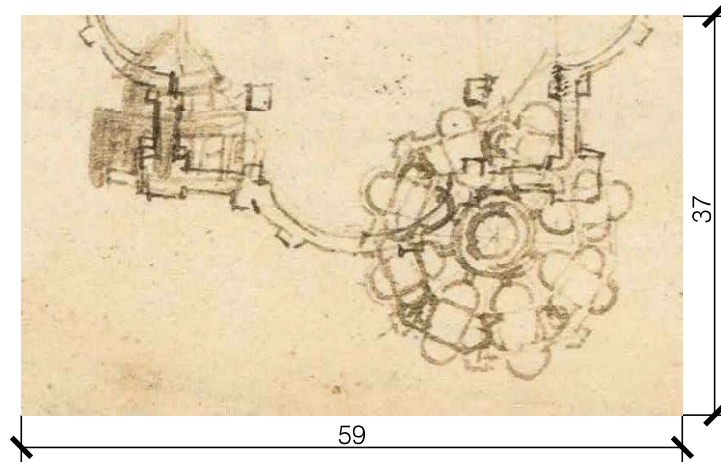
Ms. B, f. 93v: drawing of the church “C” with its dimensions in mm.
